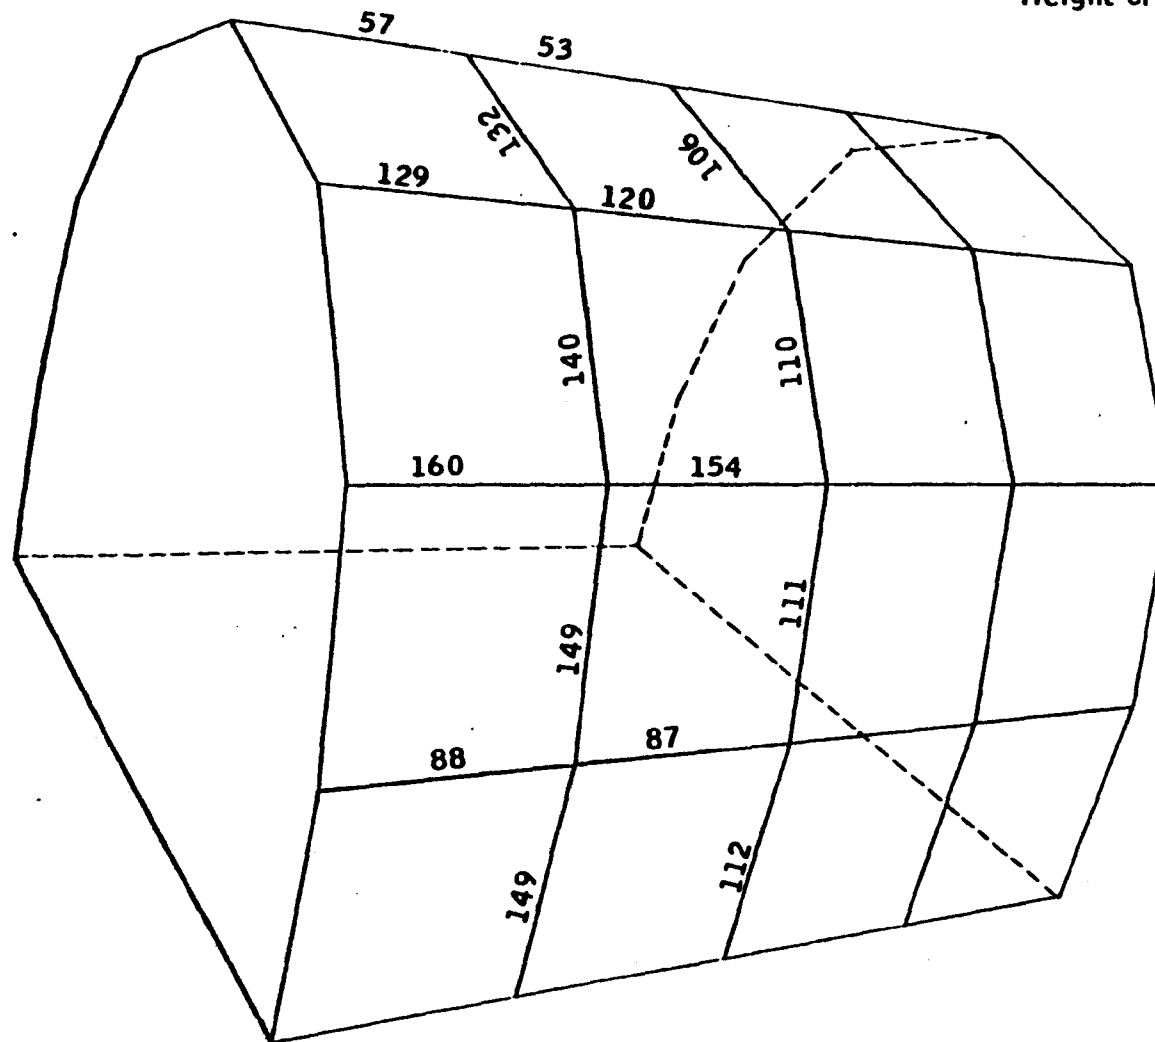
3 - Tension forces in the cables (in kN)
